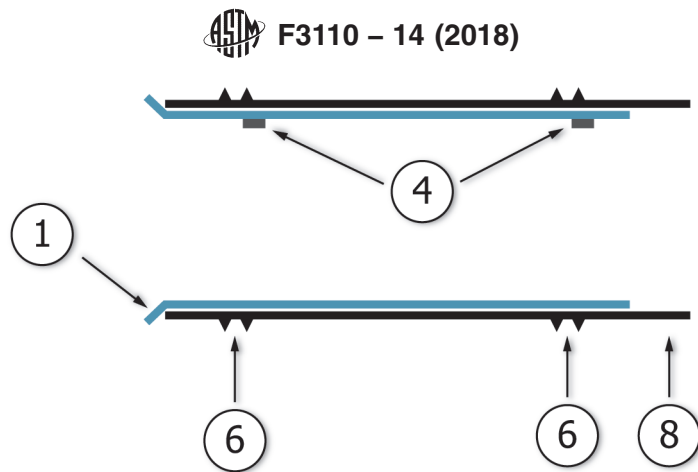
Cross Sectional View of the Sleeve and the EPDM Rubber Seals
